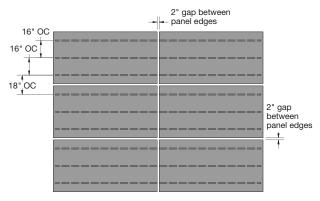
Drywall Grid Layout for 48 x 96" FeltWorks Panels Seismic Magnet Installation
